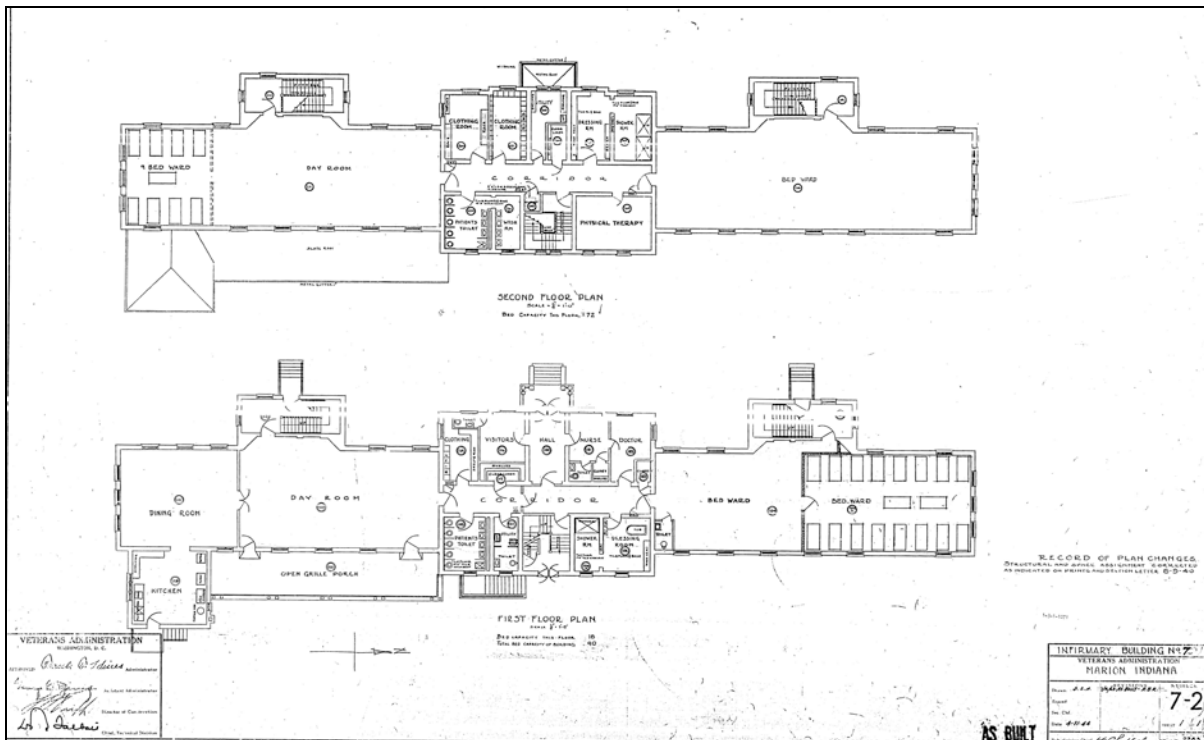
Building No. 7 Floor Plans, 11 April 1944, revised 16 July 1963
